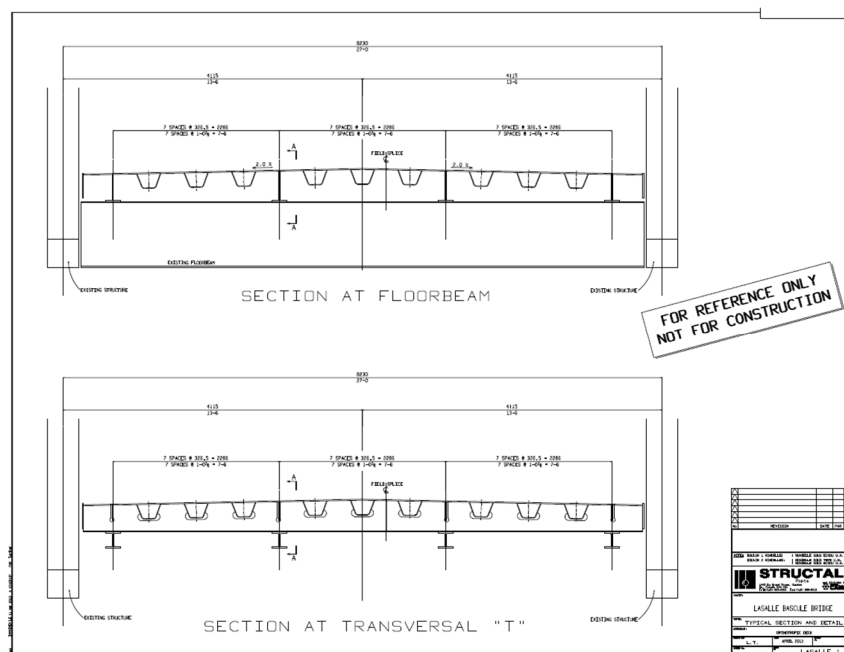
Optimized steel orthotropic deck for LaSalle Causeway Bascule Bridge
